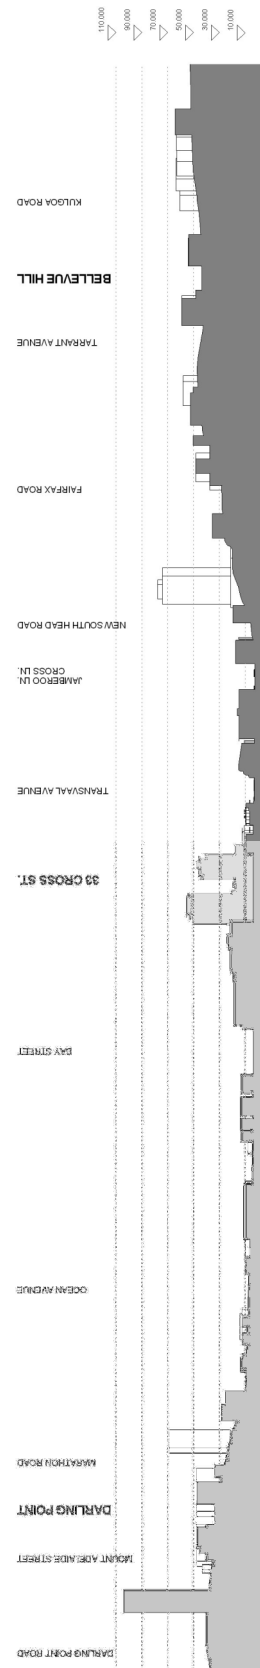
East-West sectional elevation between Darling Point and Point Piper
